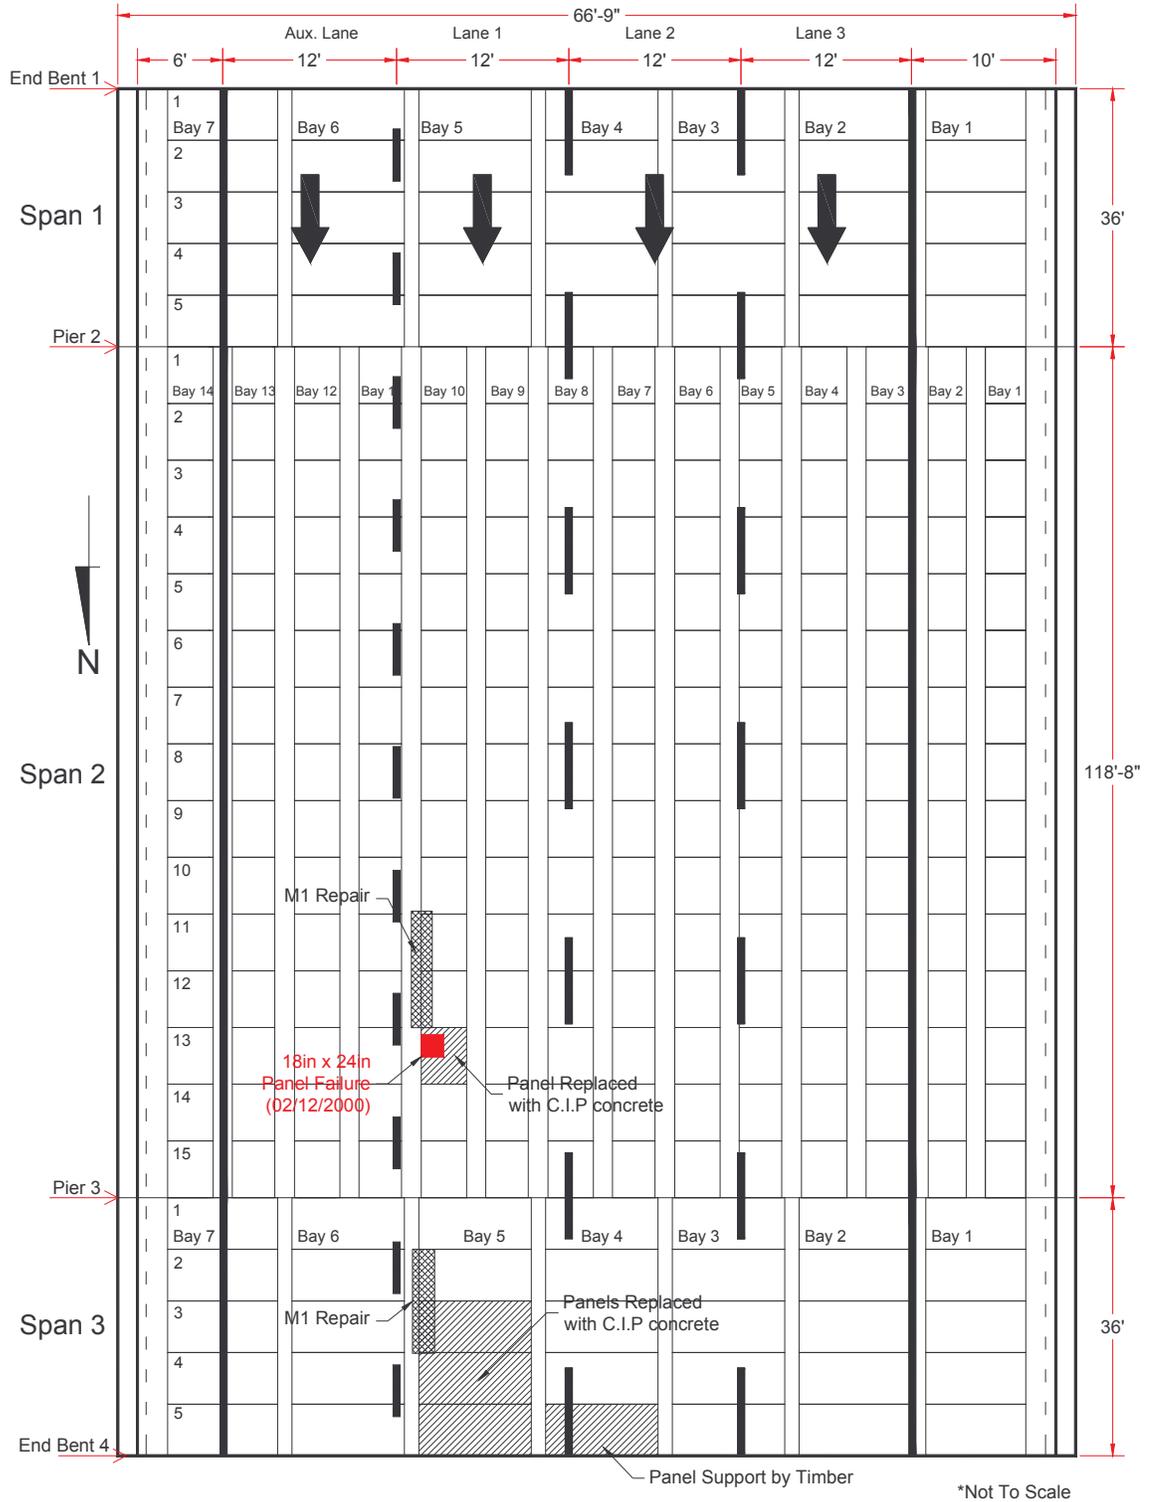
Location of Failed Panel, Bridge 170146 (I-75 NB) [3.4]
